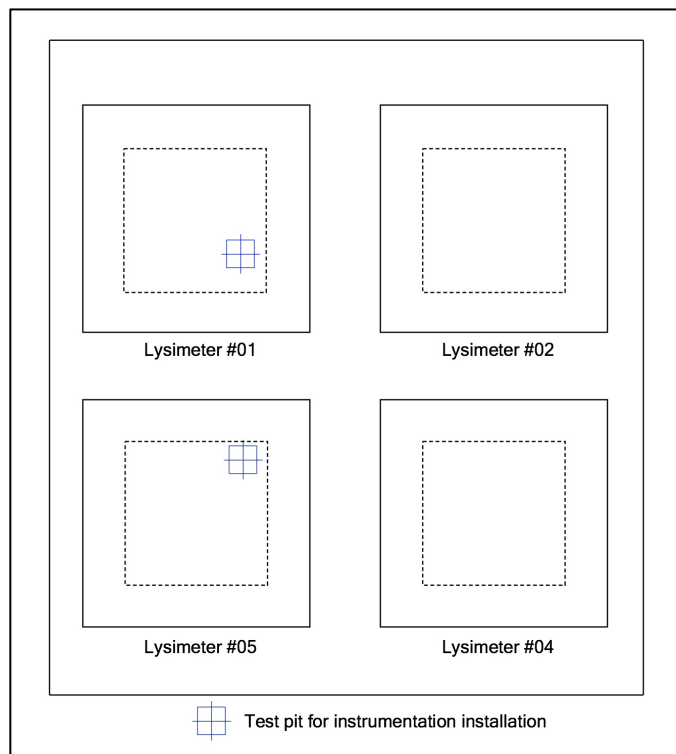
Location of the excavated test for instruments installation - Lysimeters #1 and #5
